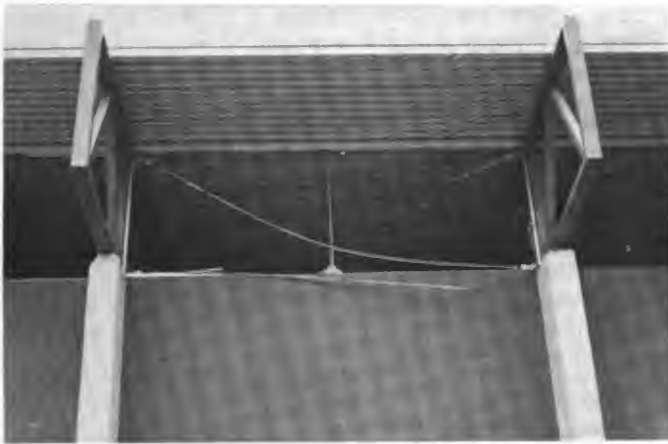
San Fernando Valley Juvenile Hall. Boys' school and gymnasium, east wall of gym. Failed rod bracing.
